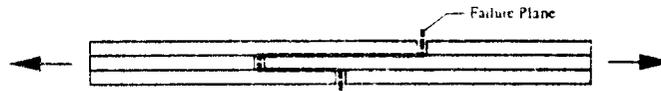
Failure plane for spliced, mechanically laminated posts loaded in tension.
